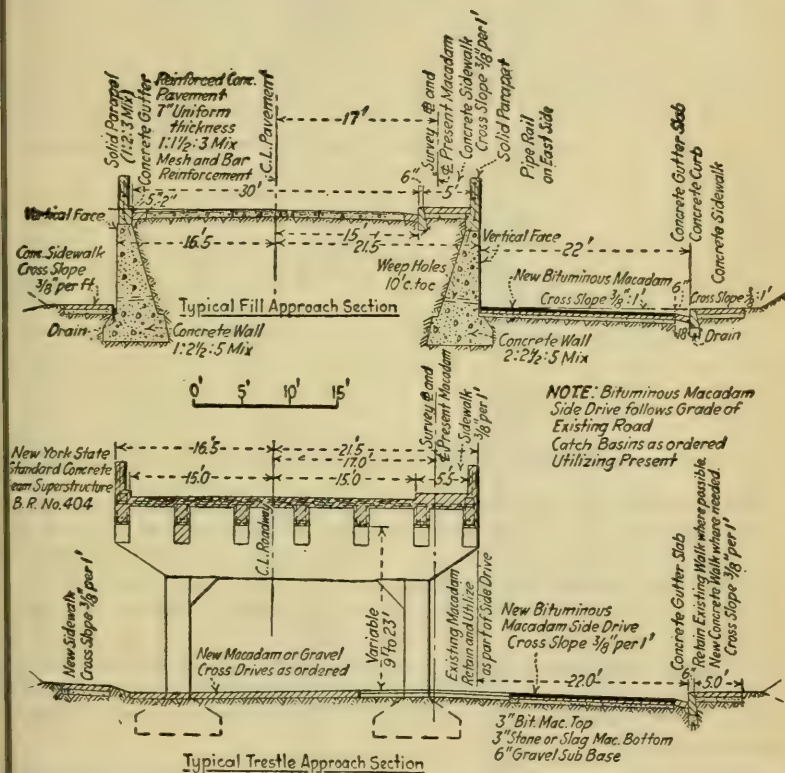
A.—Typical rural roadway approach section for overhead highway eliminations. (Village conditions.)
